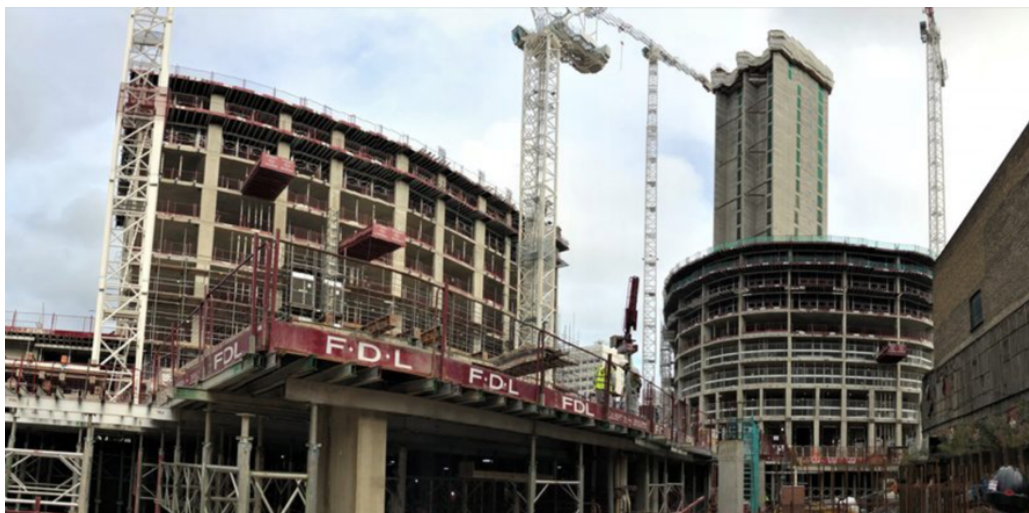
Construction site at Edgware Road, London (Source: The Author)
